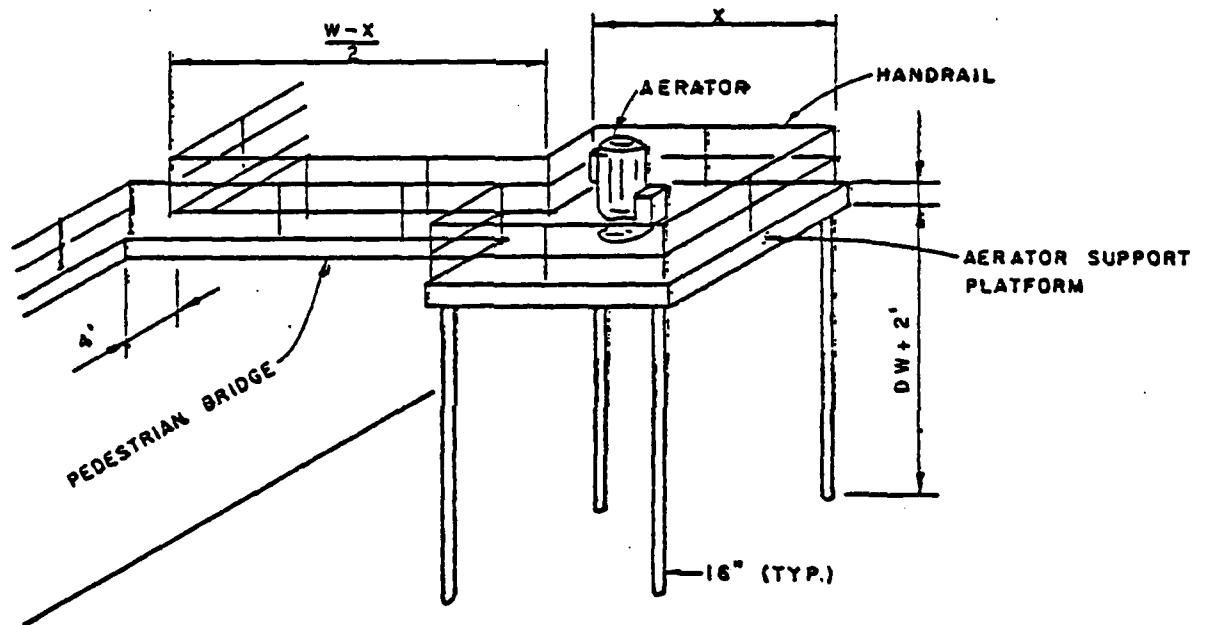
AERATOR SUPPORT PLATFORM
